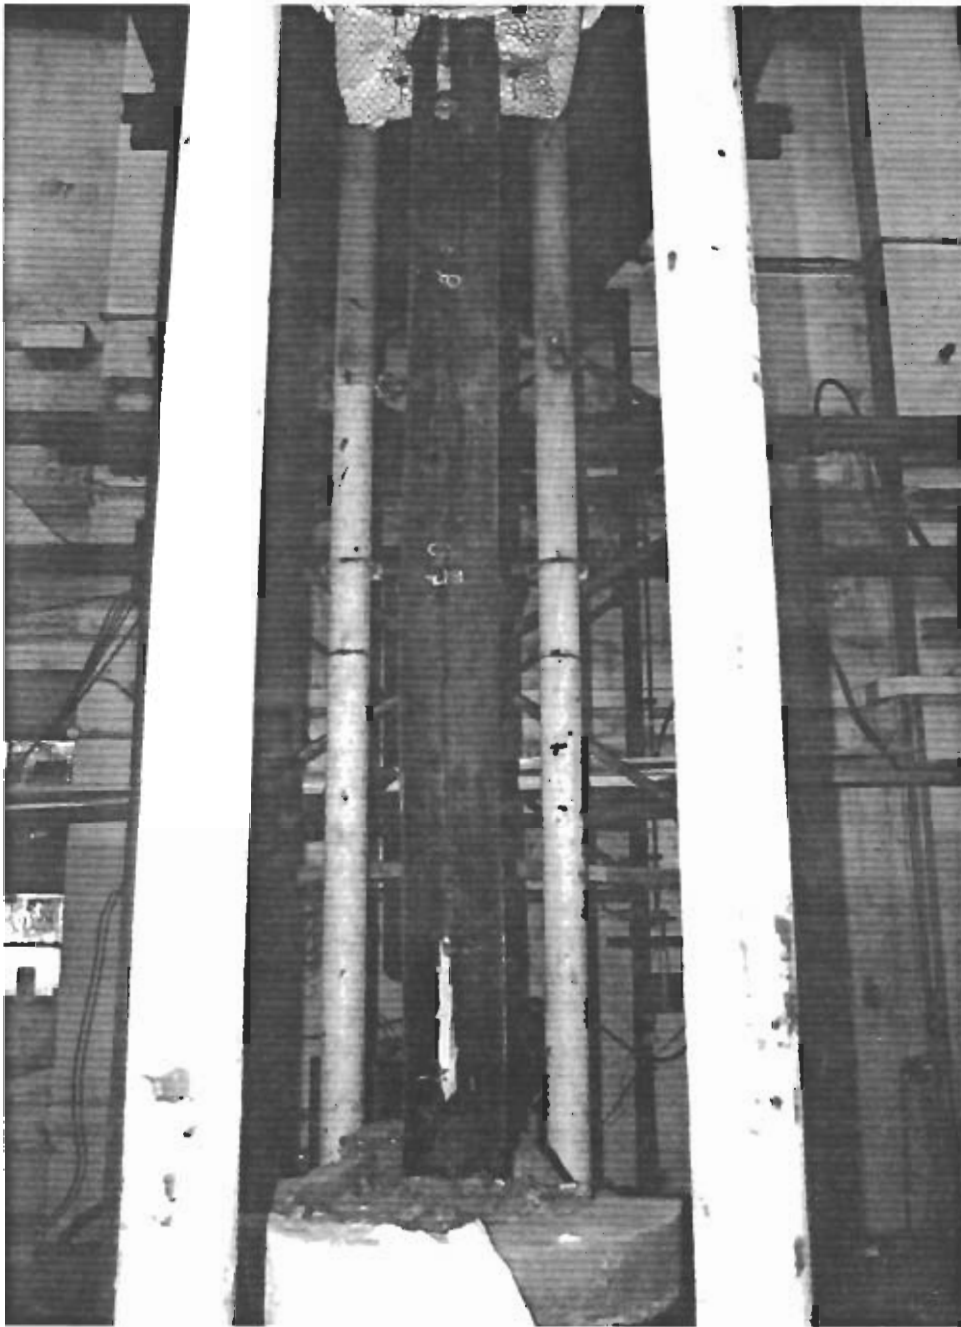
VERTICAL EXTENSION OF THE COLUMN
